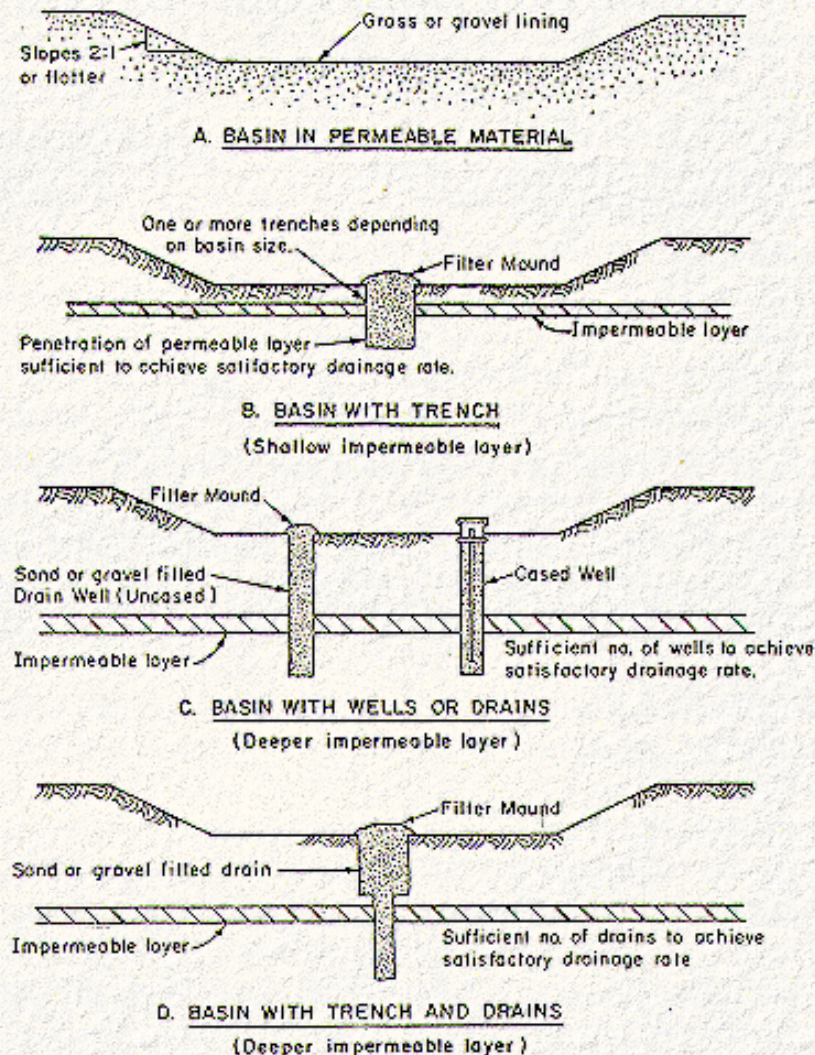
C-3. Typical Park-Type Infiltration Installation. (Fresno Metropolitan Flood Control District)
